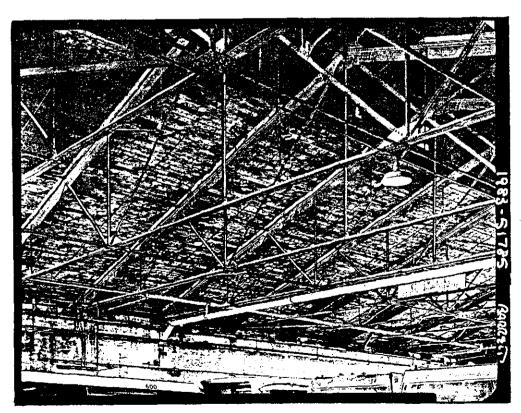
Stamford Street Railroad Company Trolley Barn: Note brickwork and riveted roof trusses.
